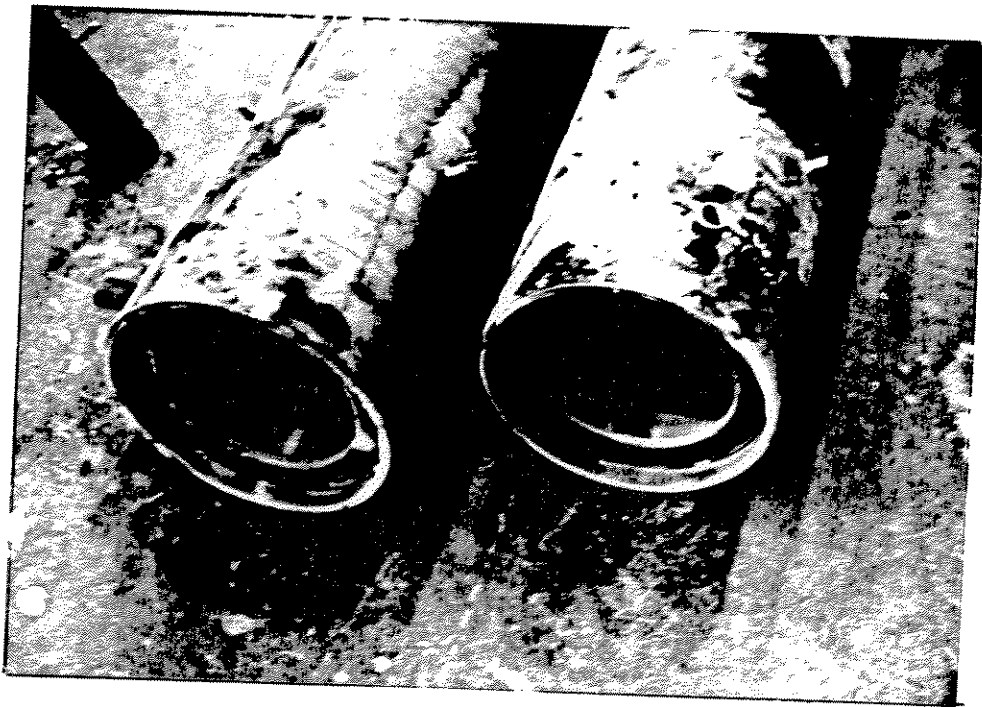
(b) - End View of Sleeve Showing Ring Stiffener and Rubber Seal
